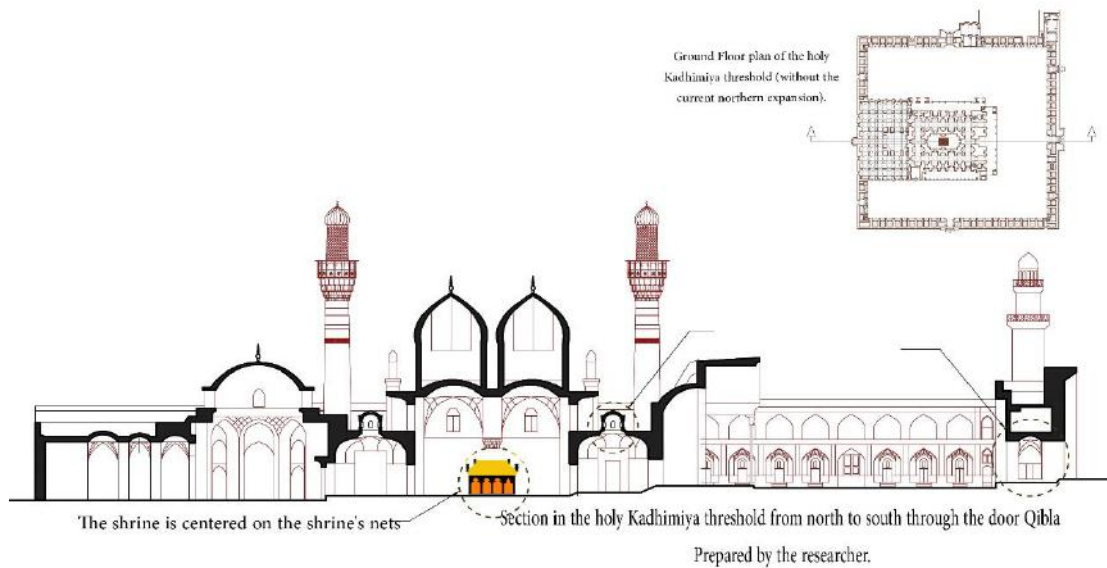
Ground floor plan of the holy Kadhimiya sill with a longitudinal section in the Holy Kadhimiya shrine building.
